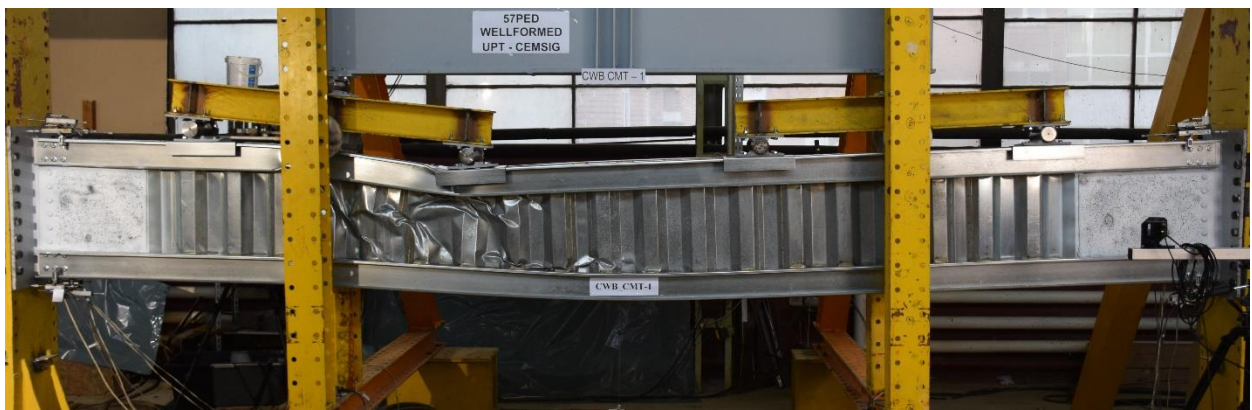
Deformed shape of CWB CMT-1 beam at failure
